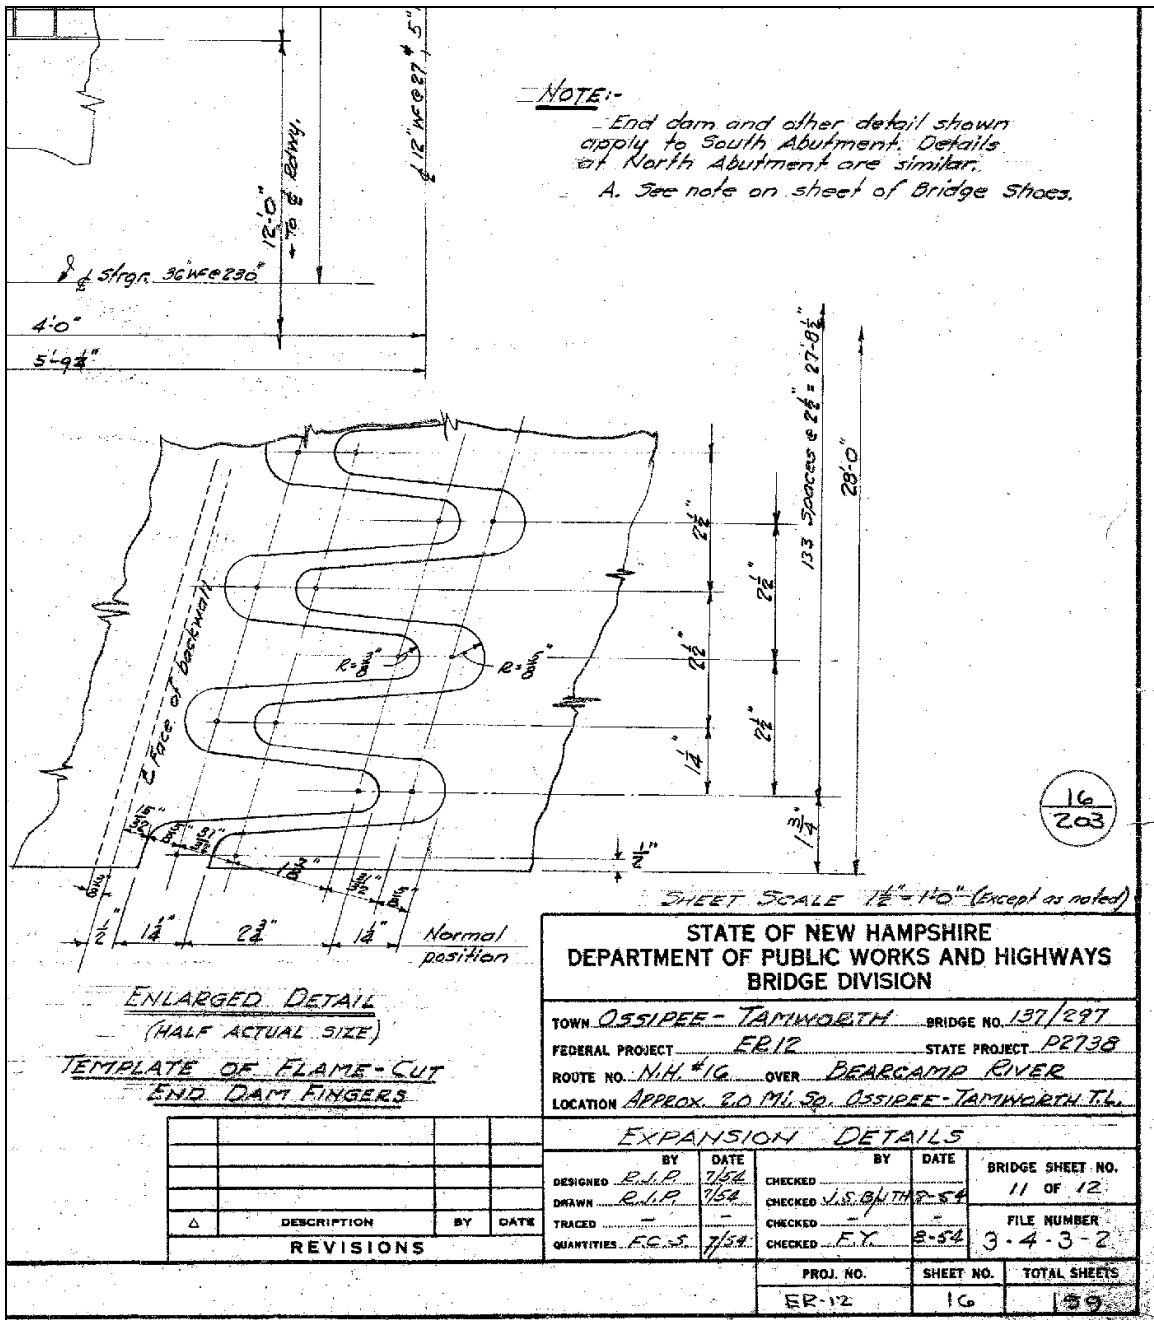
Deck expansion joint details showing custom finger-joints designed for skew of bridge by R. J. Prows. (From Sheet 11 of original drawings, NHDOT File No. 3-4-3-2).
